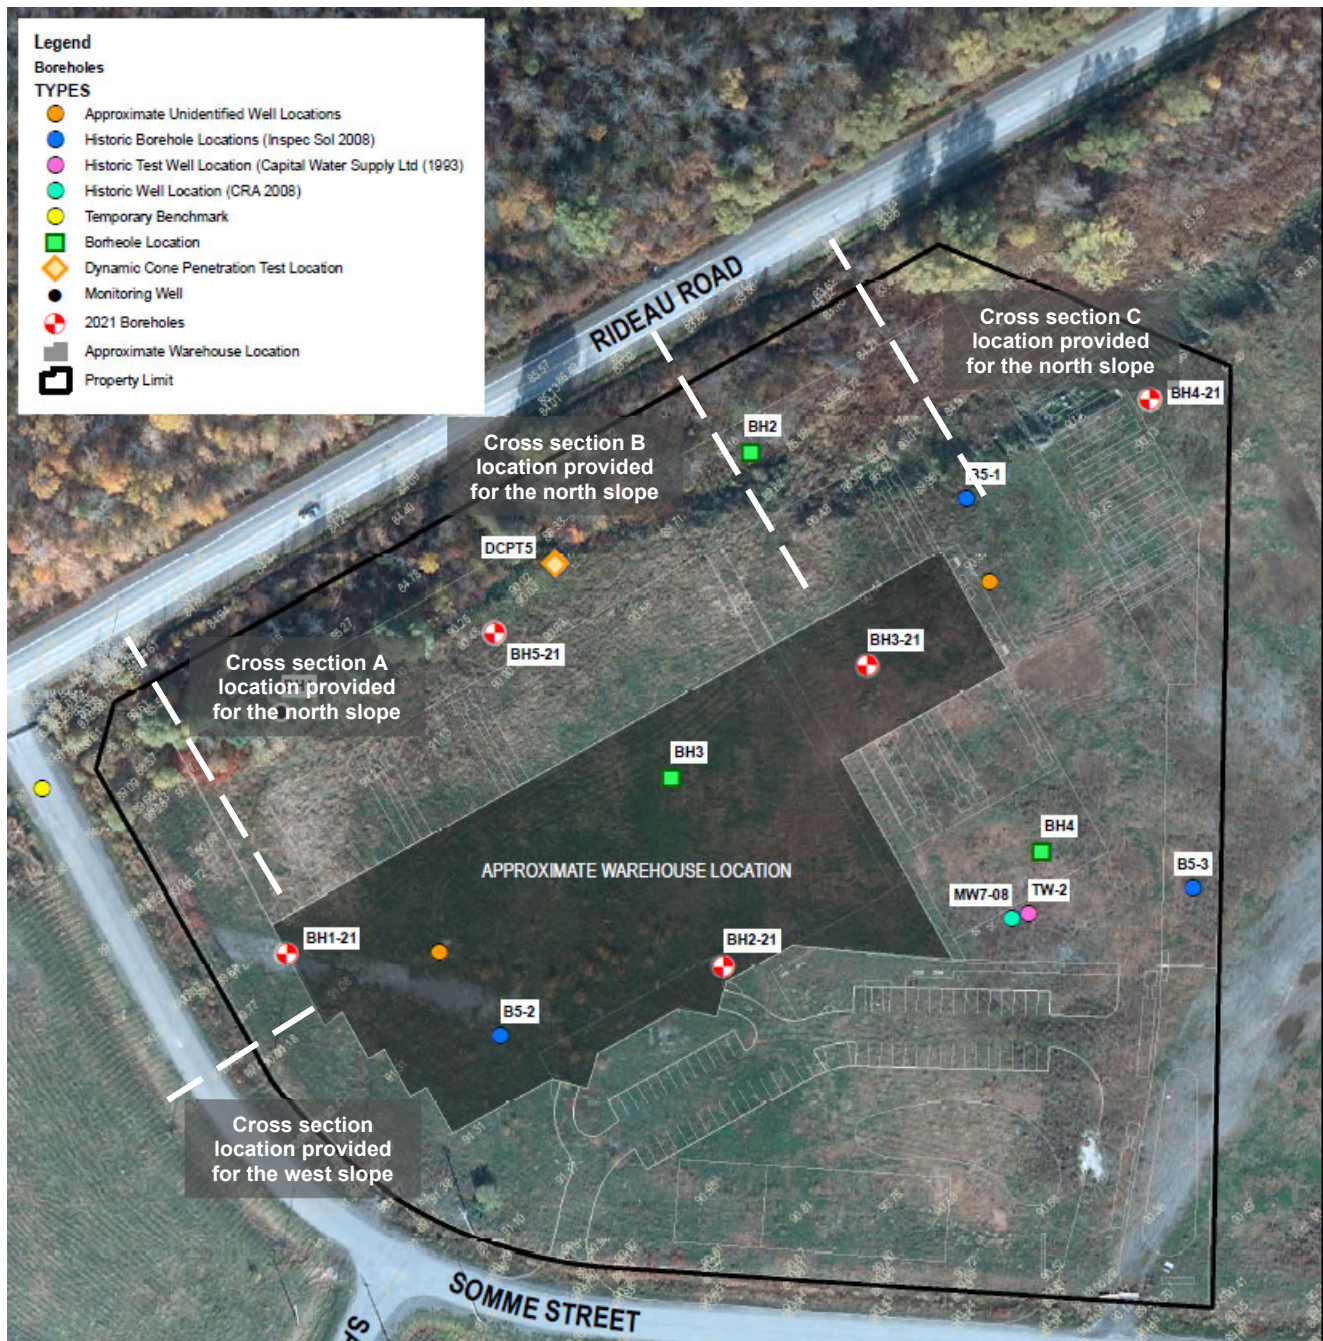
Site layout showing the location of the analyzed cross-sections and the proposed building footprint
